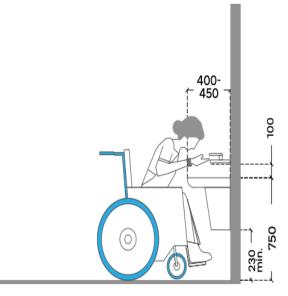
Accessible Drinking Water Foundation: Sectional Elevation (in mm)
